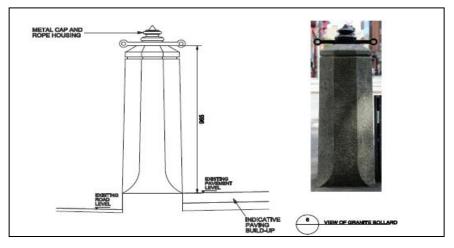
Detail of existing bollards on St Stephen's Green Park (TII)
